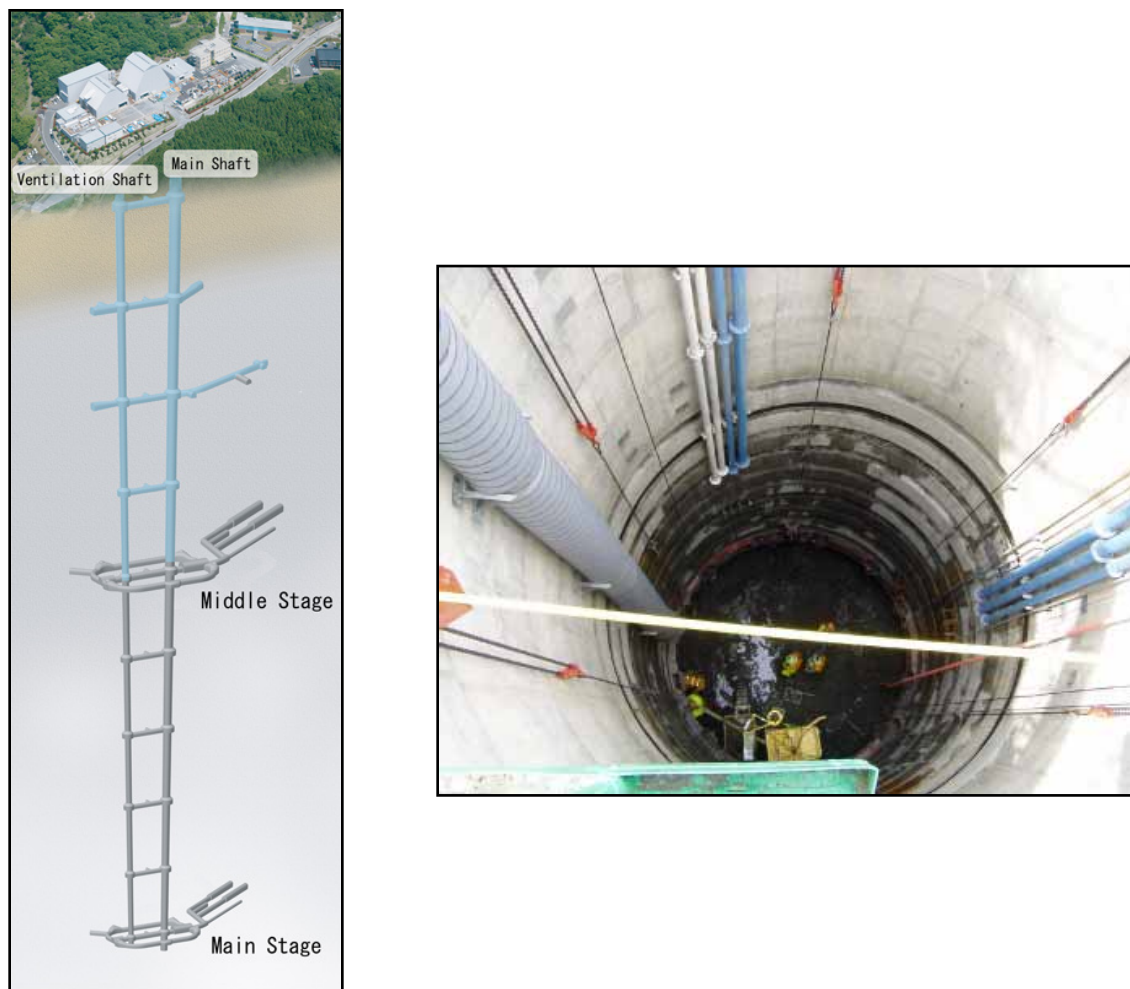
Layout of the Mizunami Underground Research Laboratory in Japan, and photo of tunnel shaft construction (http://www.jaea.go.jp/04/tono/miu_e/).
